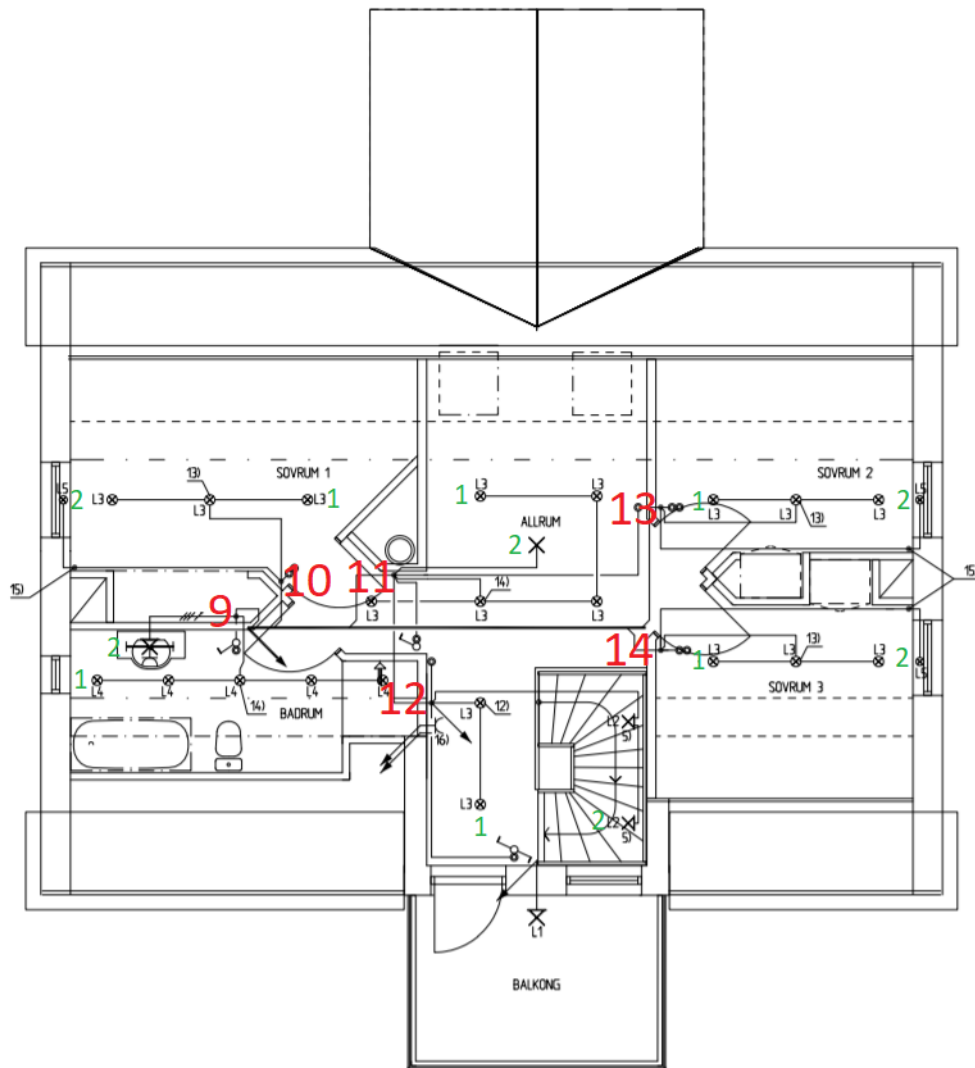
Layout of stationary and outlet connected appliances for the second floor.
